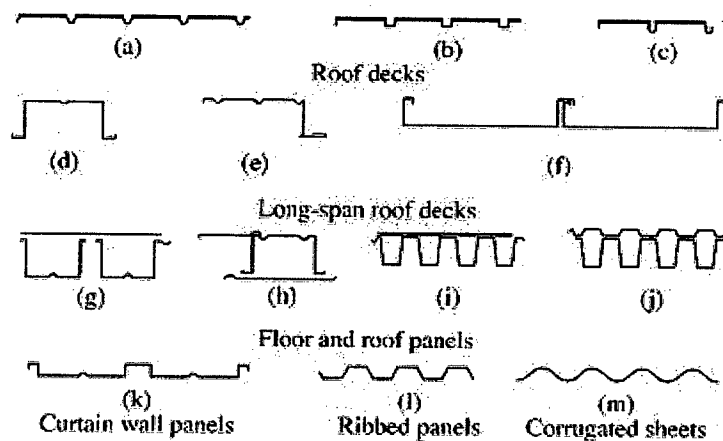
Decks, Panels, and Corrugated Sheets. (From Pham, Mills, and Zhuge, 2001 "Experimental Capacity Assessment of Cold-Formed Boxed Stud and C Stud Wall Systems used in Australian Residential Construction.")
